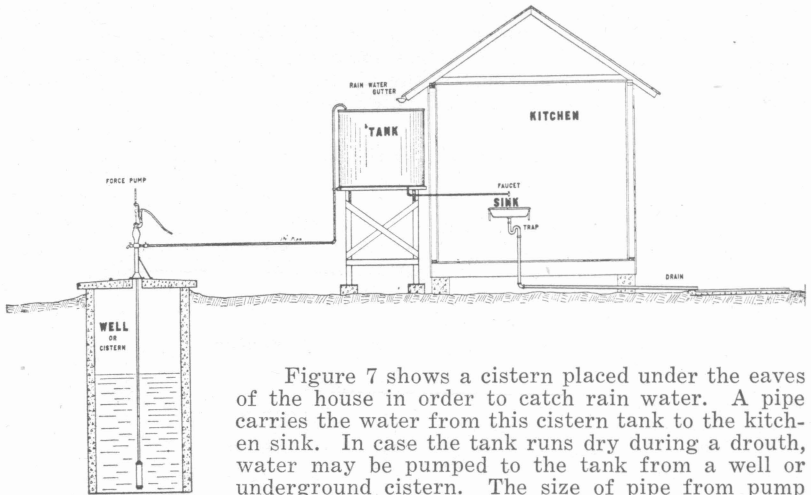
shows a cistern placed under the eaves of the house in order to catch rain water. A pipe carries the water from this cistern tank to the kitchen sink. In case the tank runs dry during a drouth, water may be pumped to the tank from a well or underground cistern. The size of pipe from pump to tank should be 1¼-inch or 1-inch, and from tank to sink 1-inch or ¾-inch.
